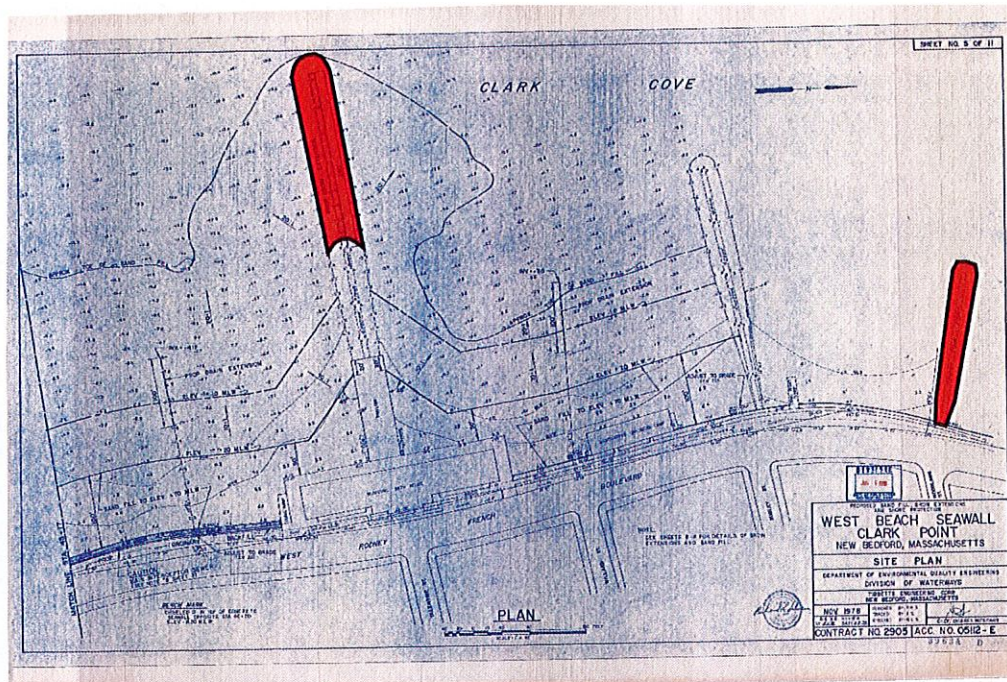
Tibbetts Engineering 1978 plan of West Beach. The footprint of Groins 1 (right) and 2 (left) are shaded in red.
